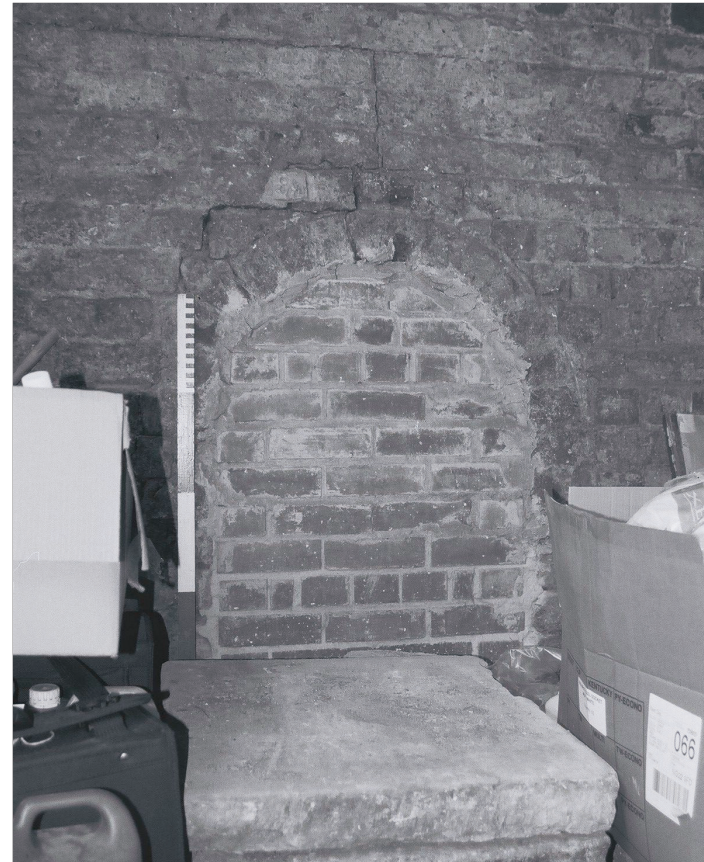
Detail of blocked arched opening, north wall of G2, Building 2 (film 7.23)
